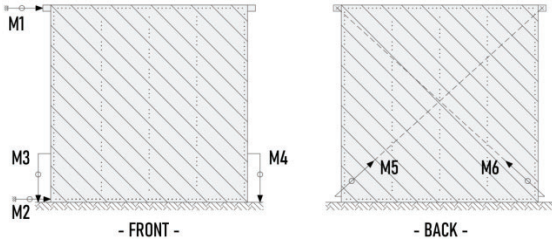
Instrumentation layout for full-scale shear-wall tests.
